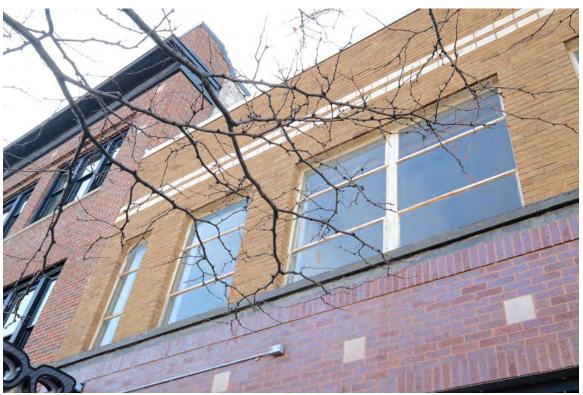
South end window units on the second floor. The south end matches the north end units. Preserve, LLC 2021.
